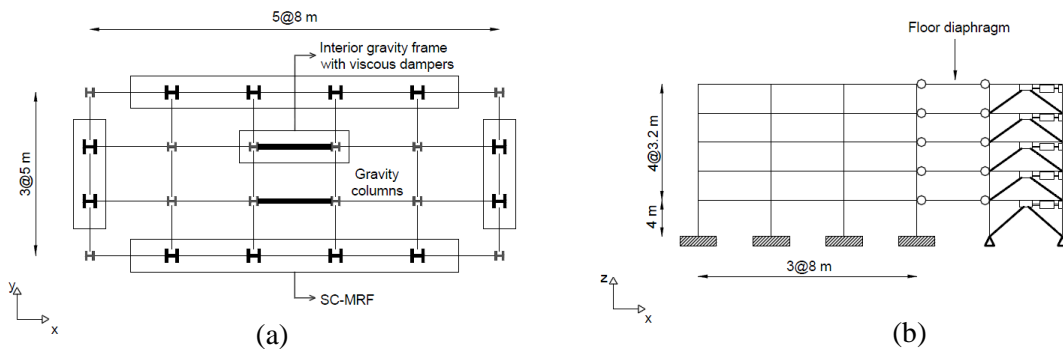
(a) Plan view of the prototype building; (b) Elevation of the prototype building
